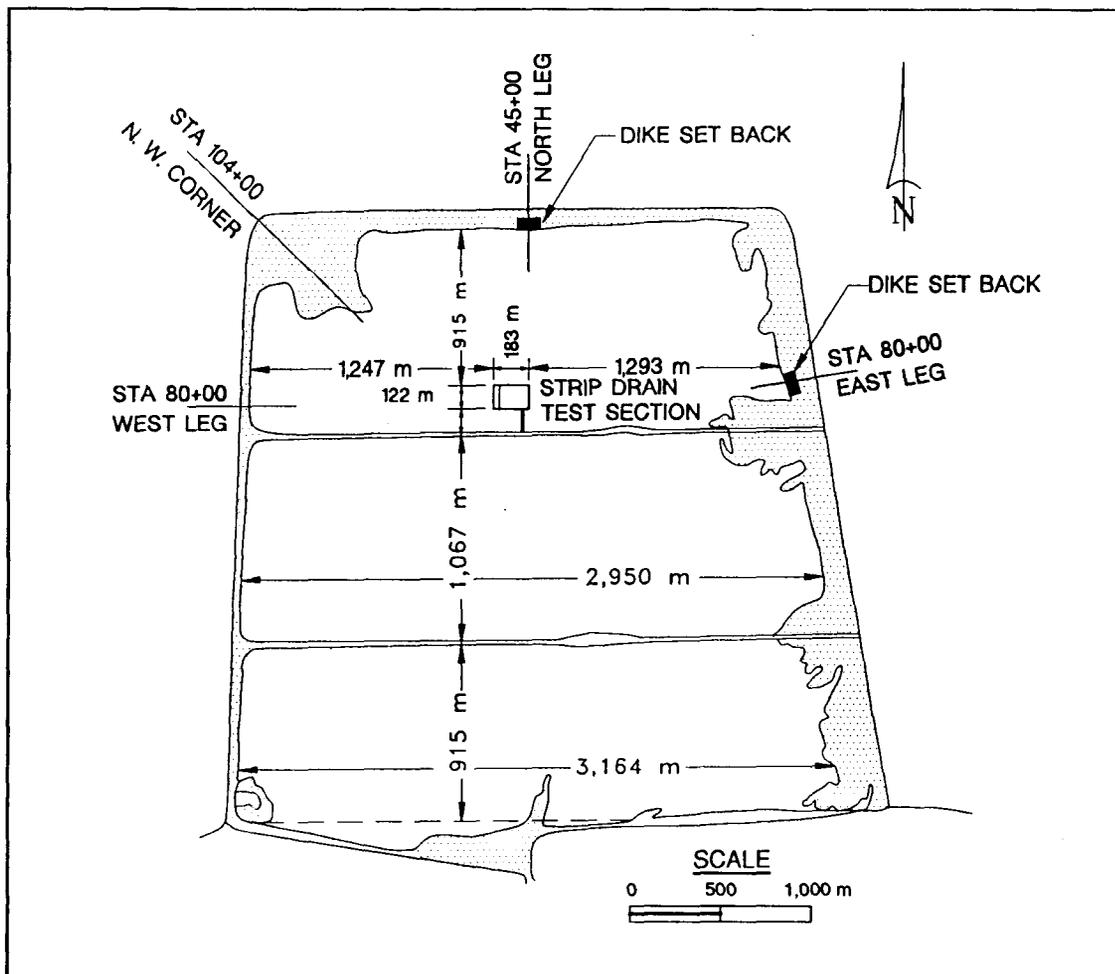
Plan view of Craney Island and location of vertical strip drain test section
